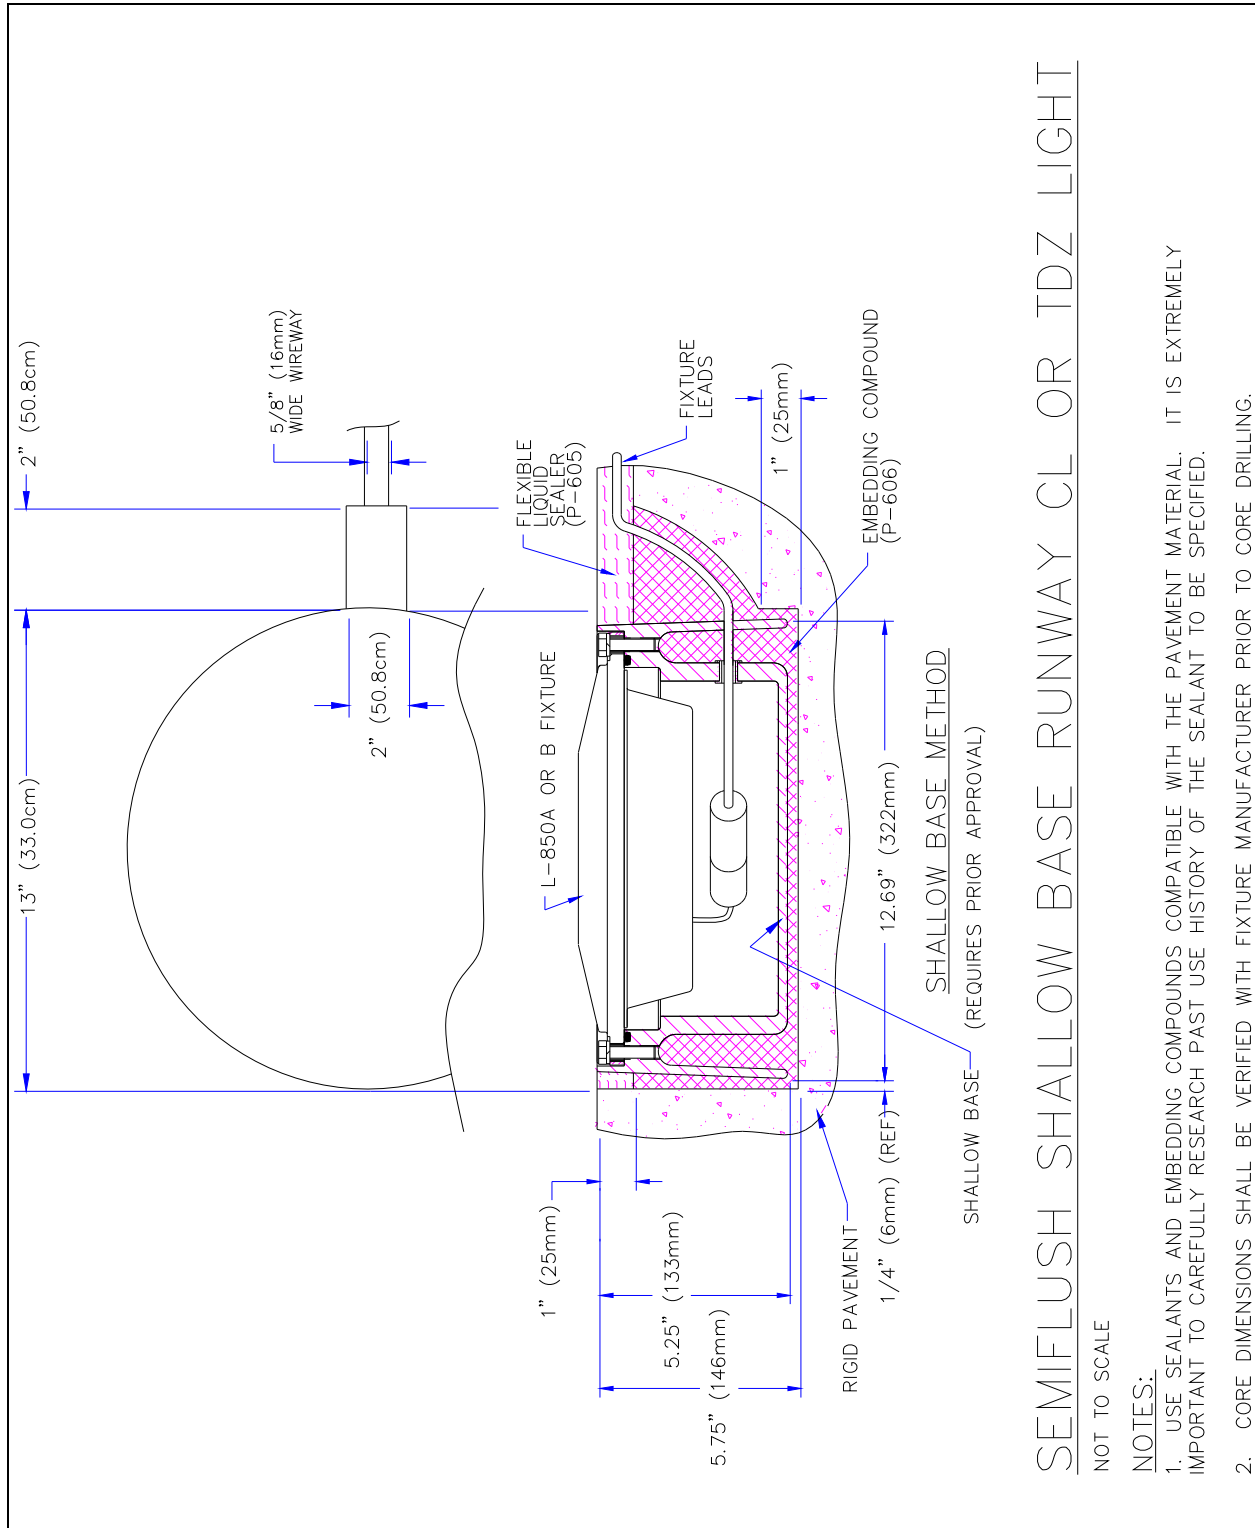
In-pavement Shallow Base Runway Centerline or TDZ Light.
